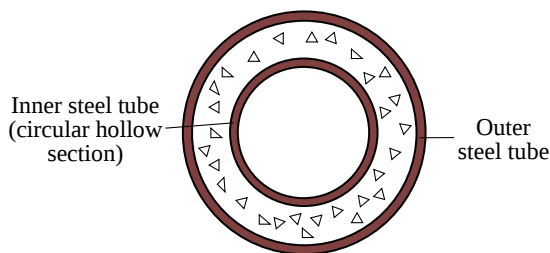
Cross-Section of column with concrete-filled double-skin steel tubes (CFDST)
